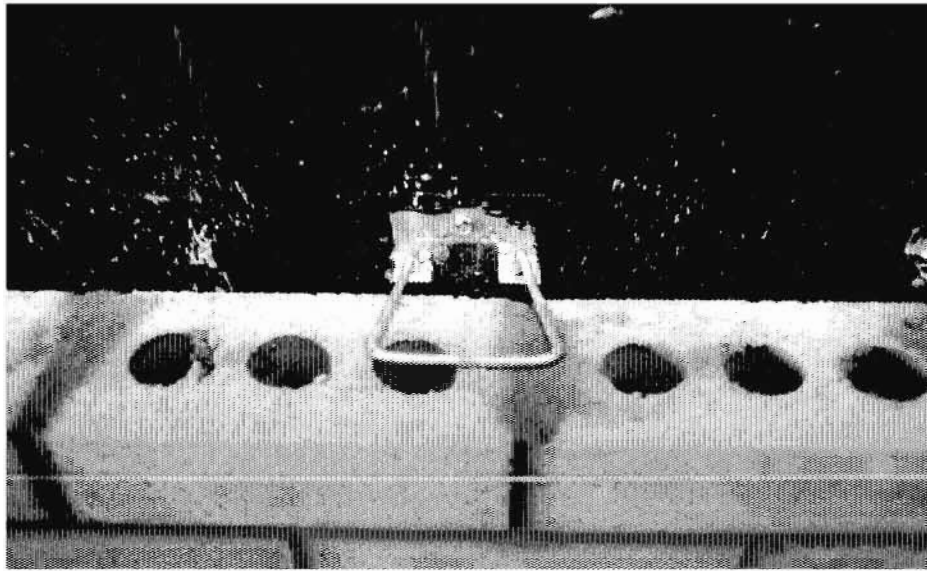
POSITION OF WALL TIE SYSTEM IN VENEER
